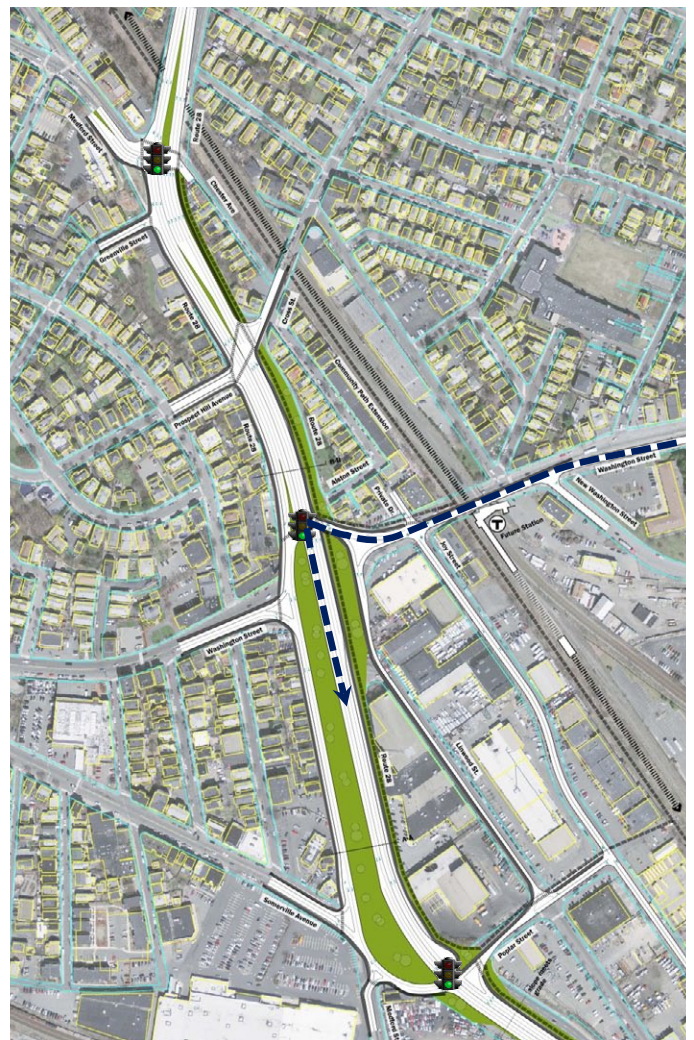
Washington Street Westbound Left Circulation for Linwood Access Road Alternative
